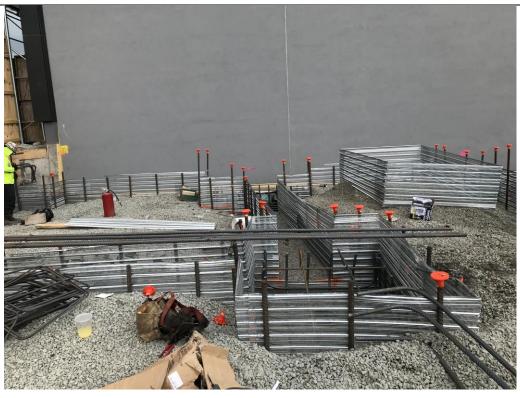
View of excavation in waste characterization grid COMP C (0-5) around pile
